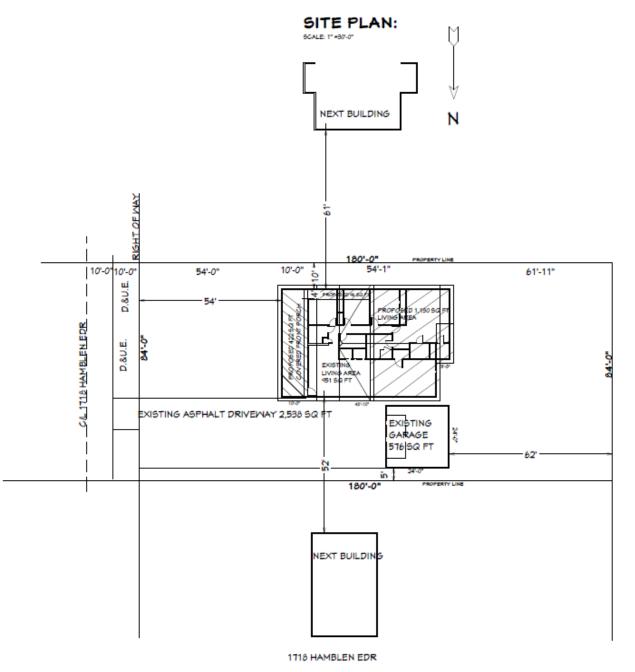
Proposed site plan for 1718 E Hamblen E Drive.
